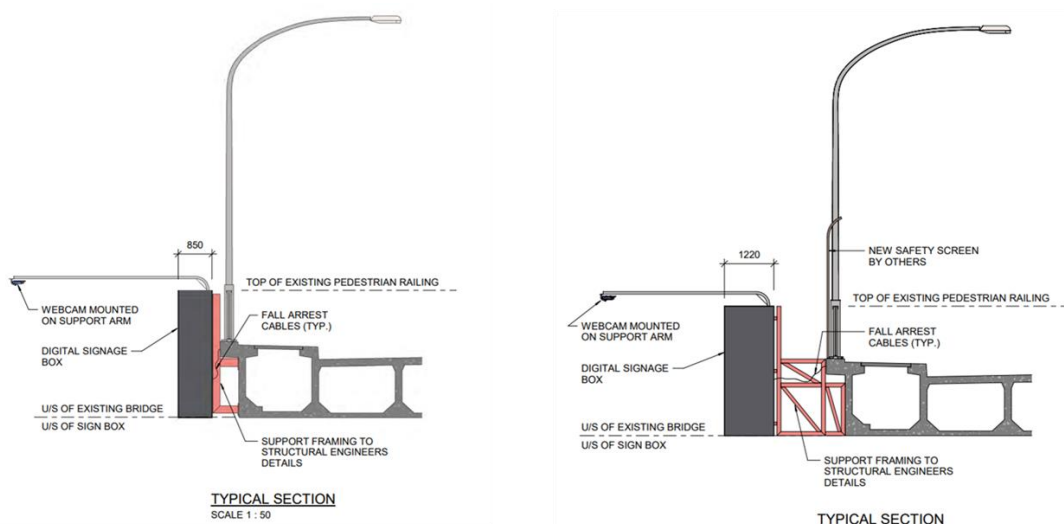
Width of signage box - approved plans (left) and proposed plans (right) (Source: Arcadis/DBCE)
